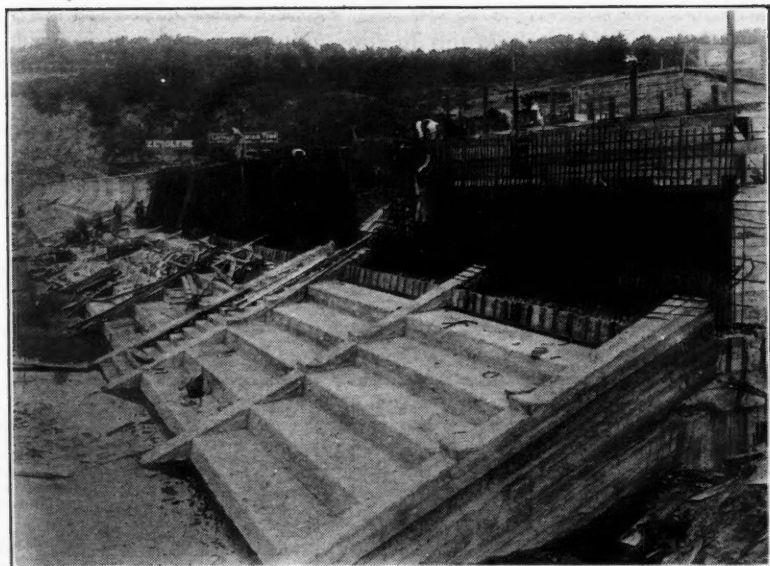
ROLLWAY AND PARAPET, OCEAN BEACH ESPLANADE, UNDER CONSTRUCTION.
